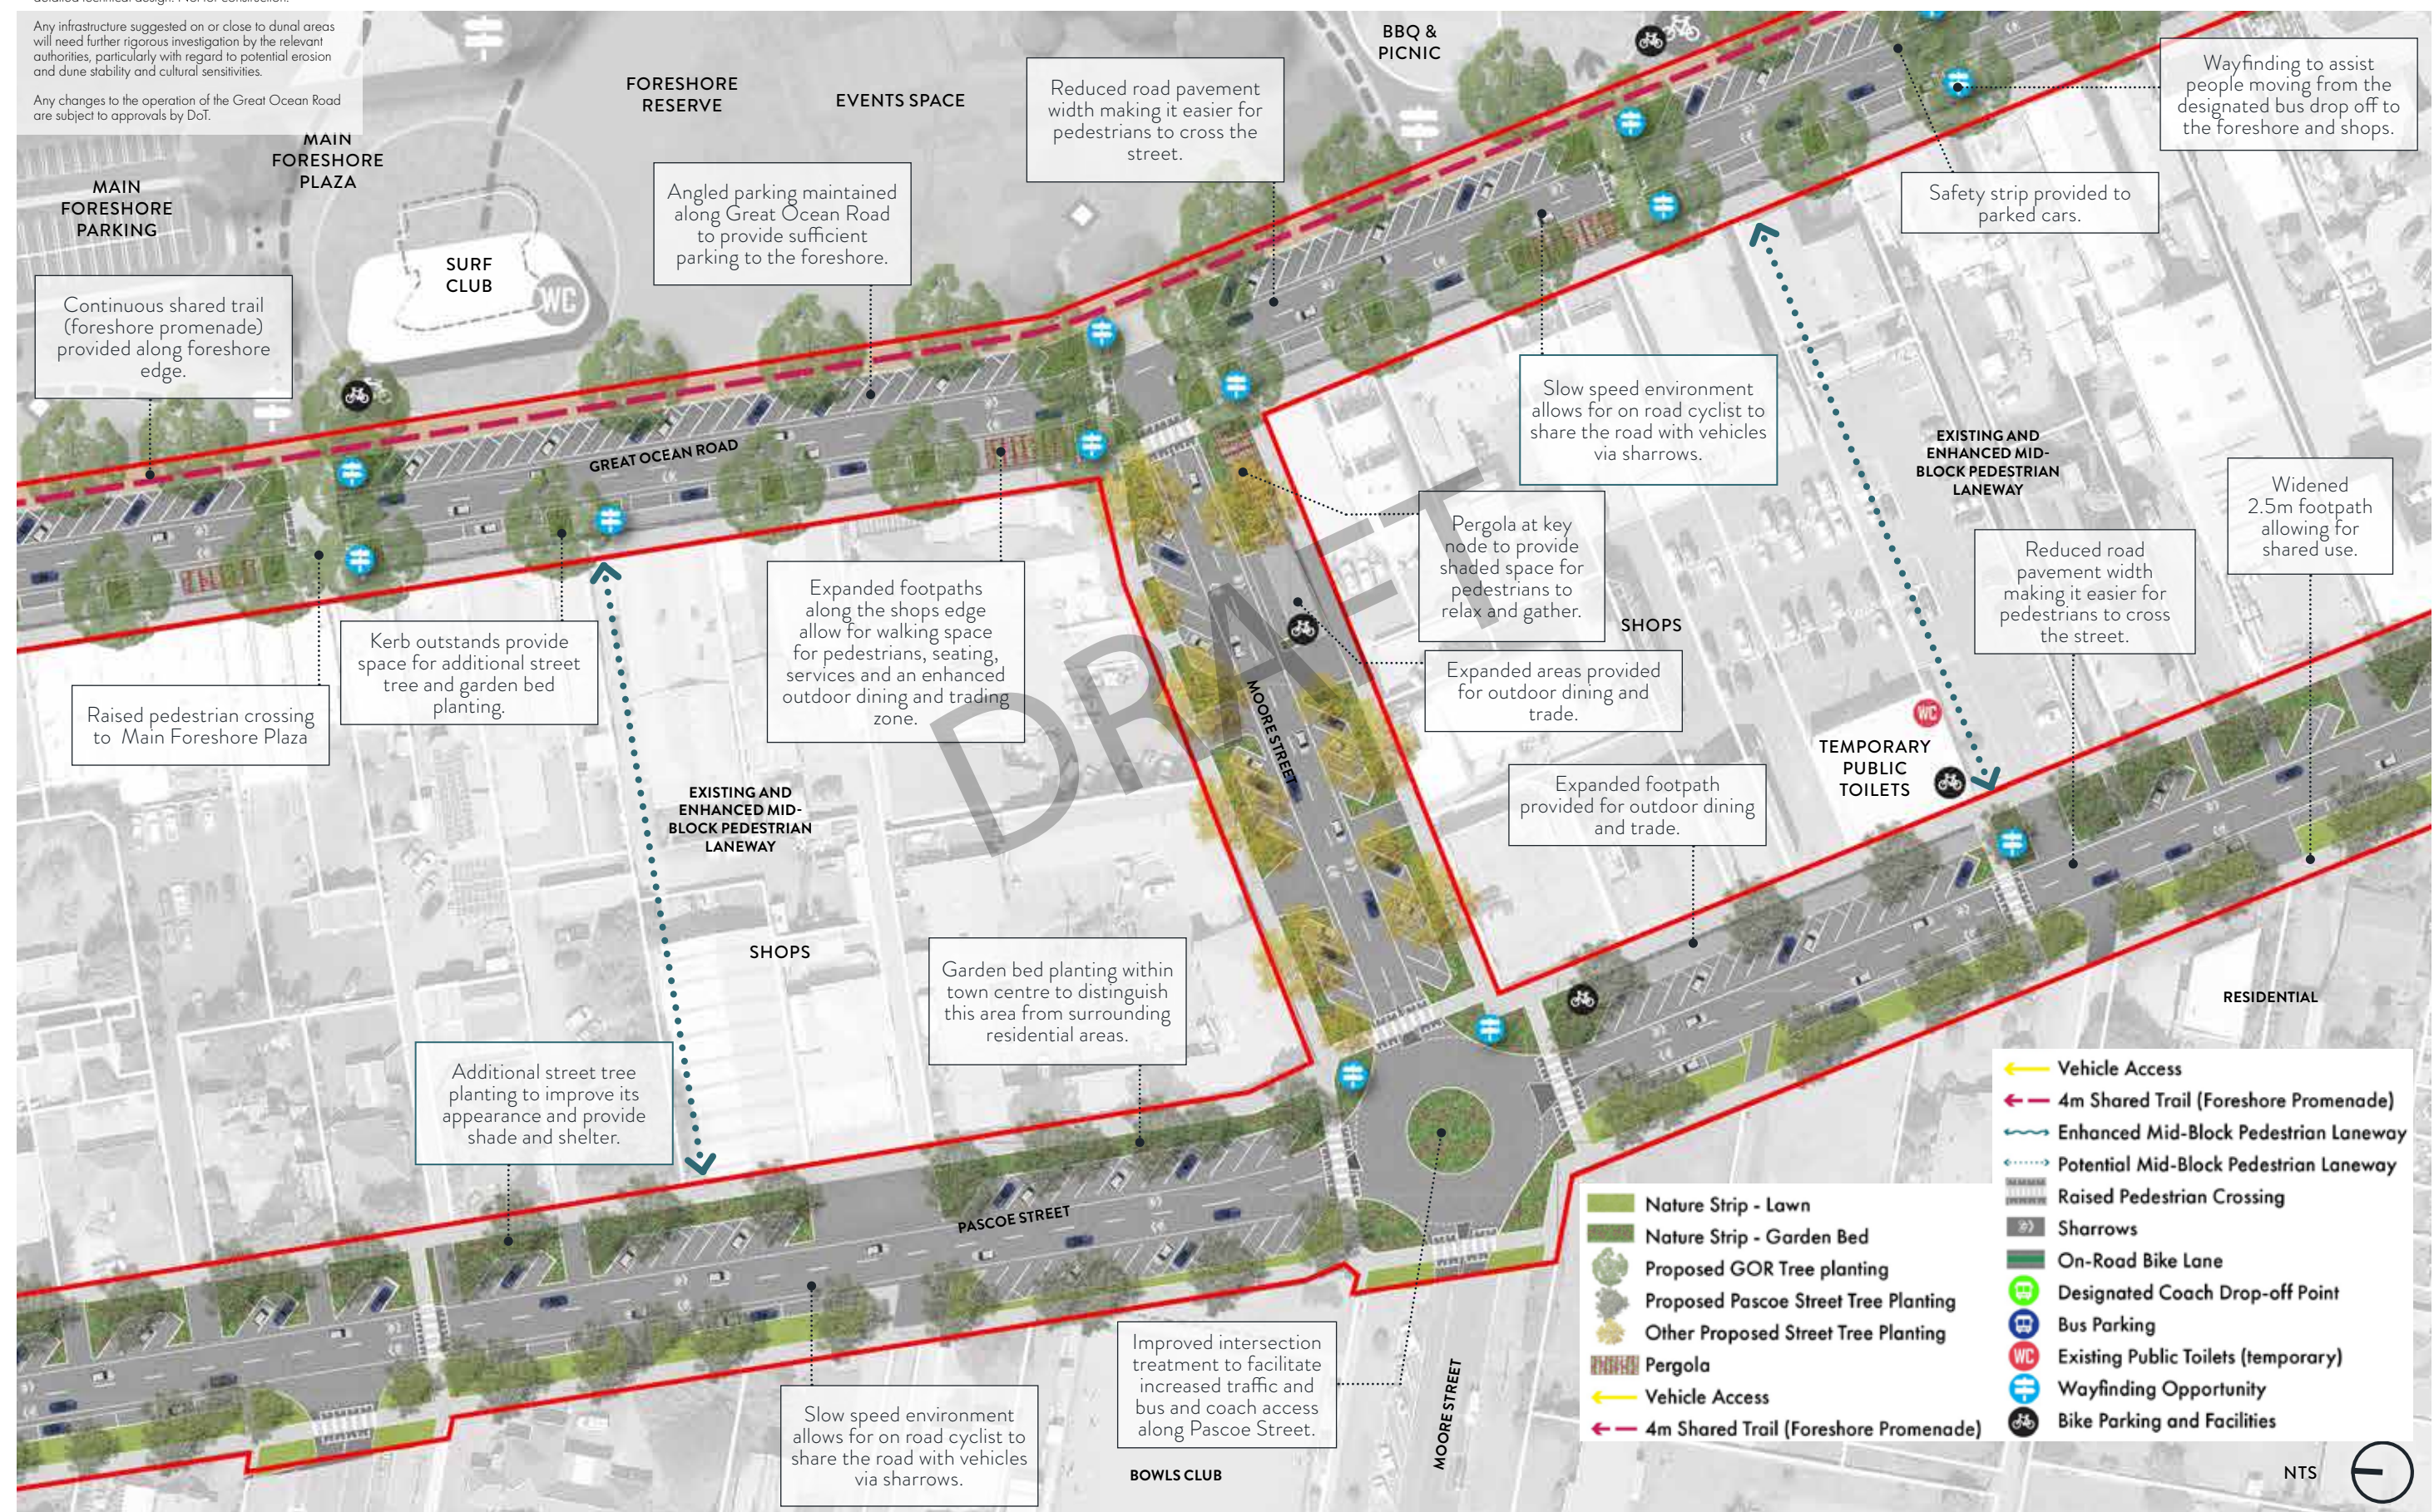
Detailed Streetscape Plan 1 - Option 2 - Two-Way
